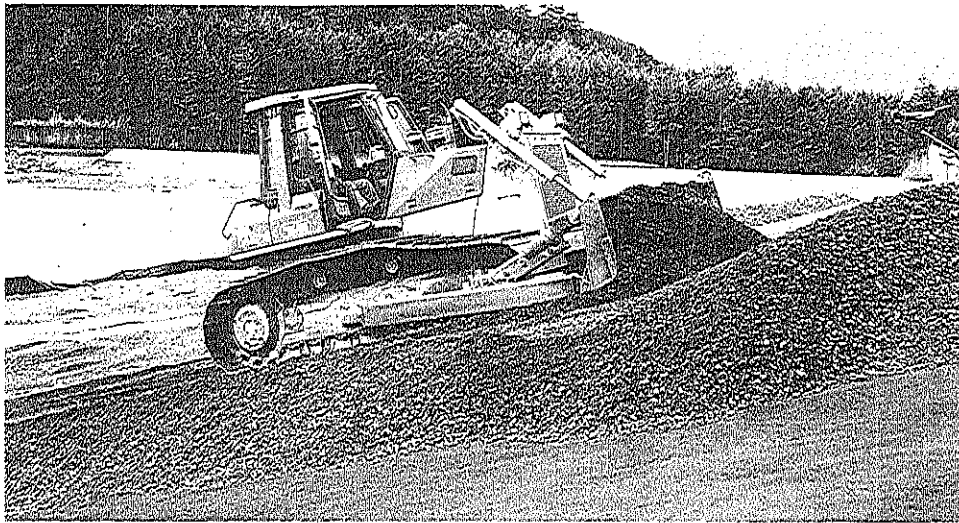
Slope liners. Fine rockfill being placed over a composite polypropylene / non-woven geotextile on a 3:1 canal slope. The small dozer spreads the fine rockfill from bottom to top of the slope with no turns permitted. Section shown on Figure 18.11(b).
